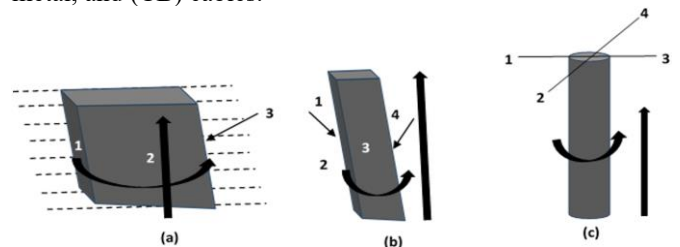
Image acquisition of Gazebo in UAV (a) first abutment (b) pier or column in parallel (c) pier or column in cylindrical manner
